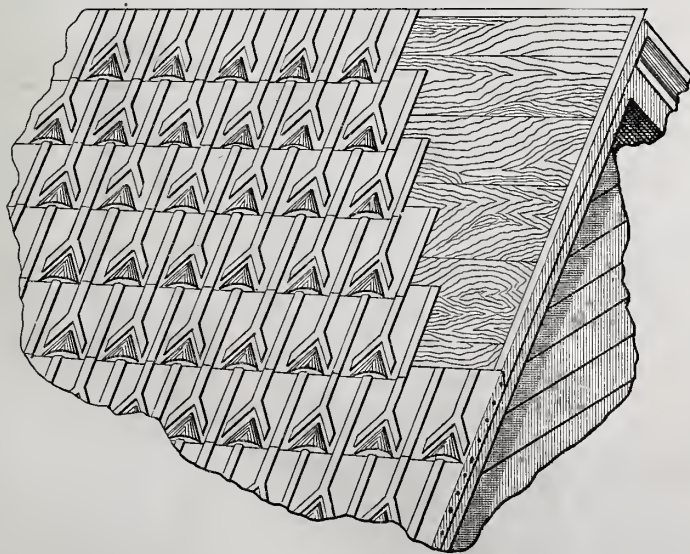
Appearance of Roof Covered with Walter's Metallic Shingles.
